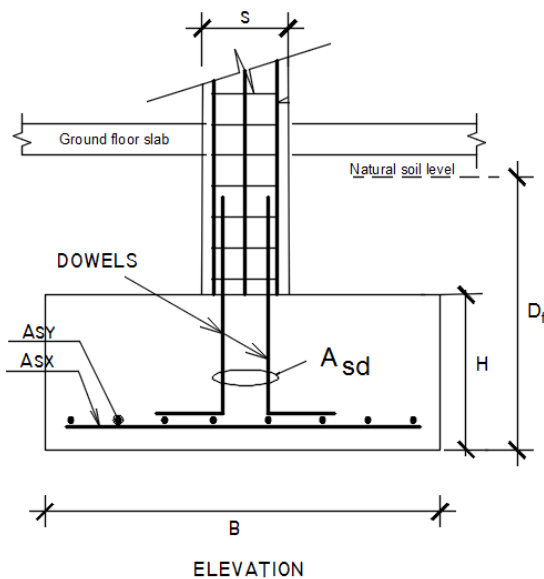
Dowels placed to avoid bearing failure.
